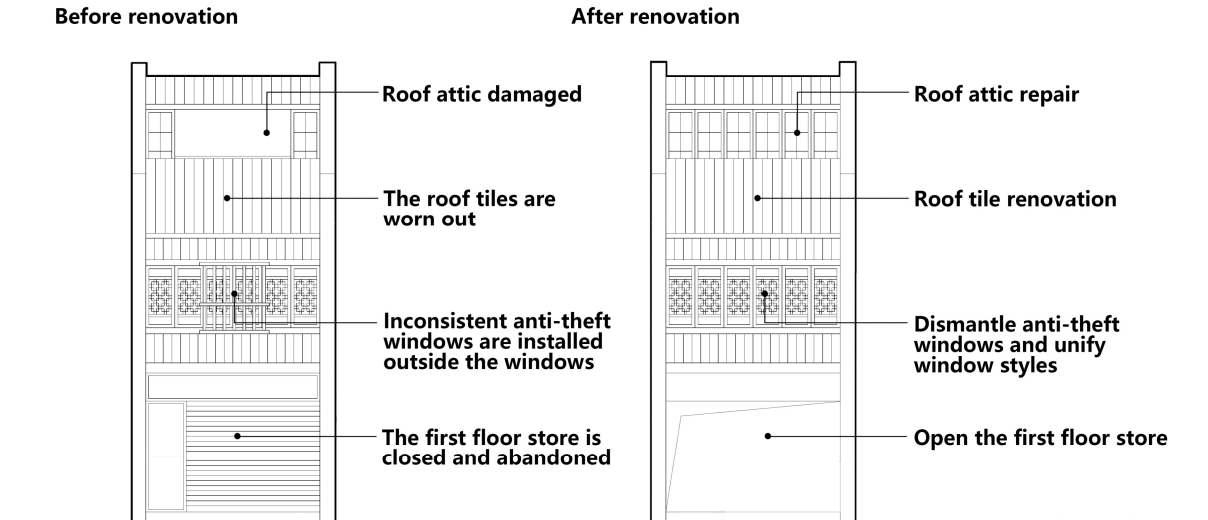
Street Node 1 Residential Building at No. 55 Haopan Street Pre - and Post Renovation Elevation
